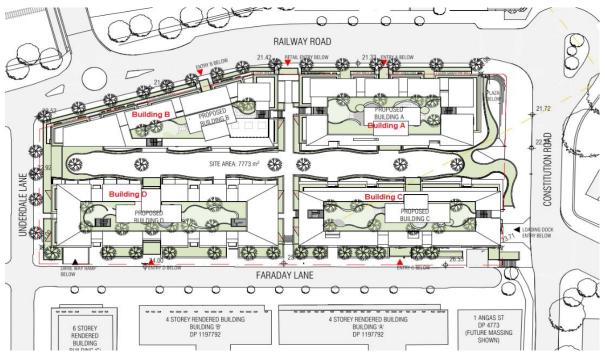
Plan showing the development, showing the roof level and location of each of the buildings.
